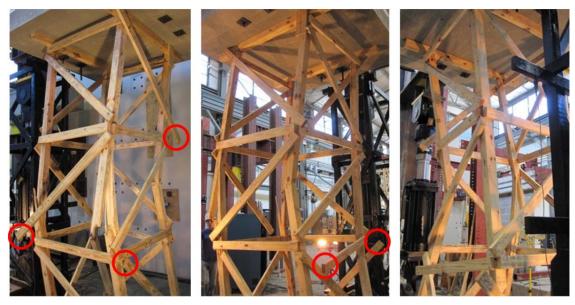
Photographs of the Five Brace Connection Failures at End of Test
